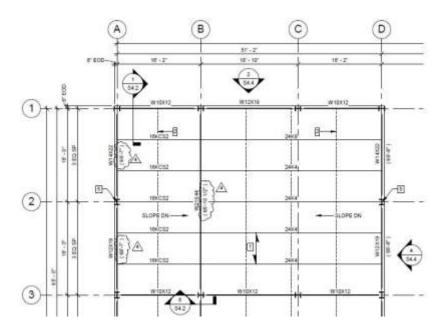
Typical Roof Framing Plan (Enlarged) (Image Credit: Larson Design Group)
